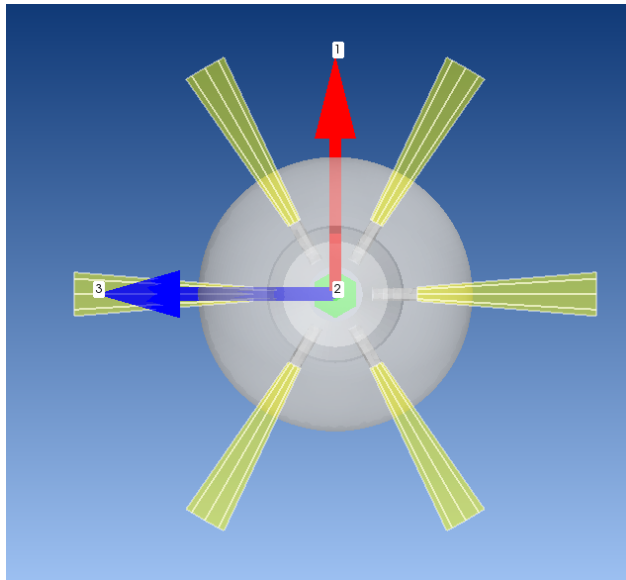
SISO - Straight Pipe with Radial Perforations - IFC - Top View
